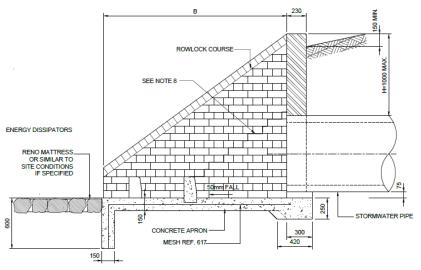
Typical Stormwater Headwall with Energy Dissipators
